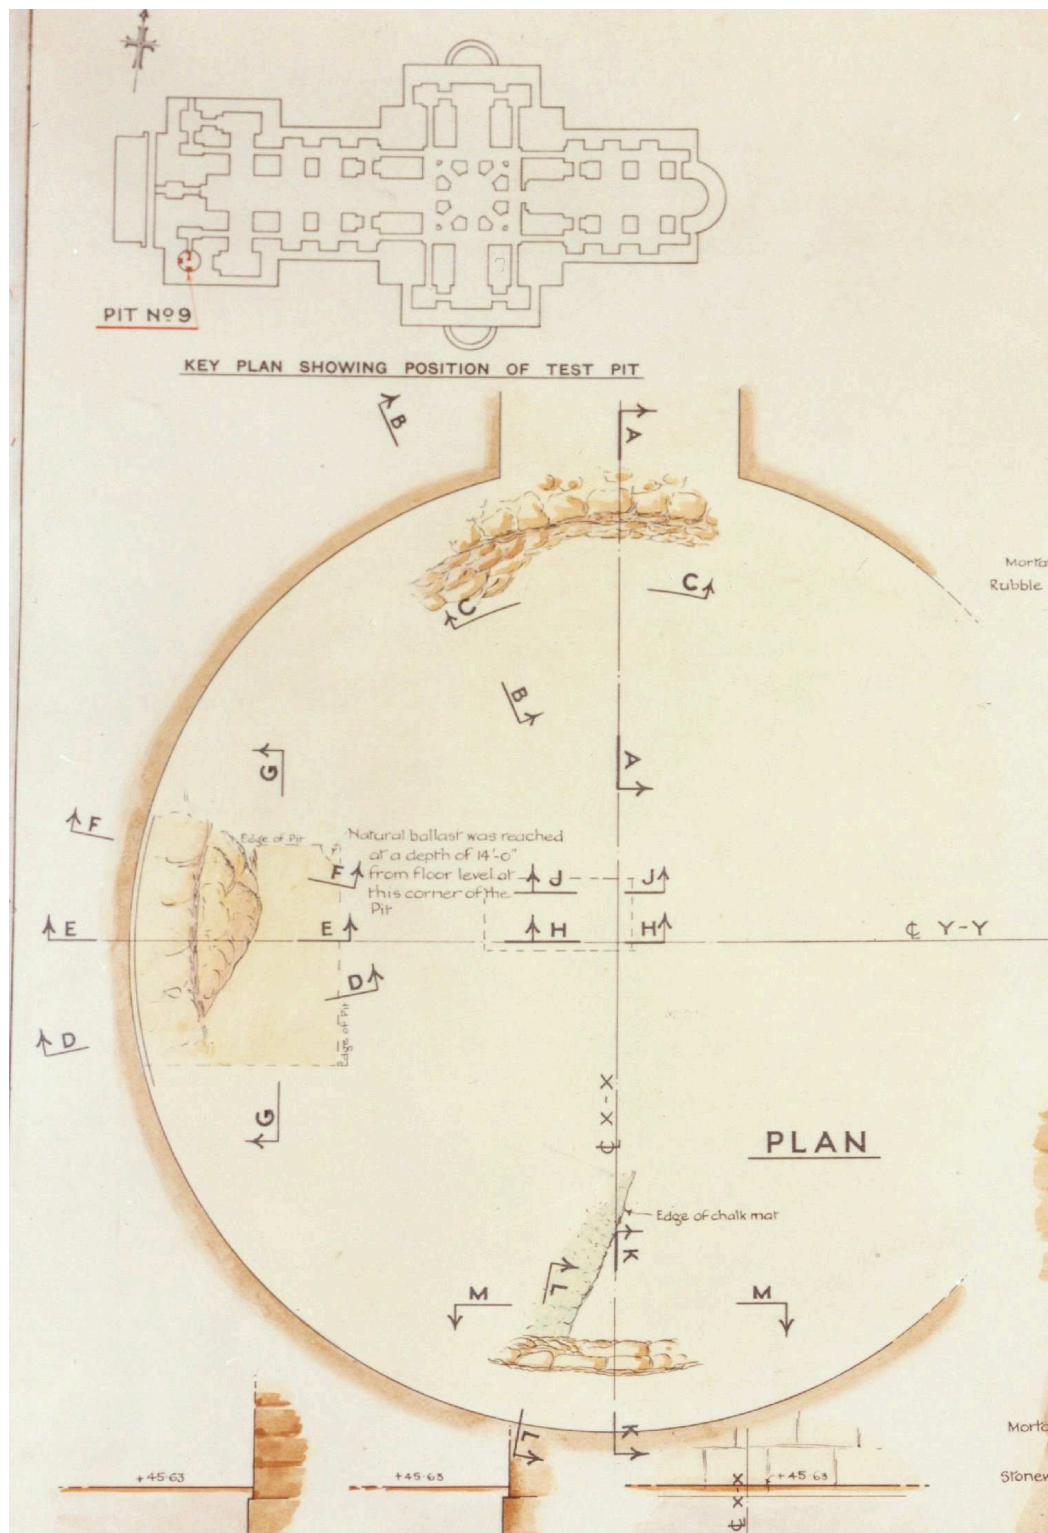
Gibb-Freeman test pit 9, 1932: plan of the group of pits within the domed chamber under the south-west Wren tower (SPCAA). Compare with the plan of excavations in 1996, Fig 2
